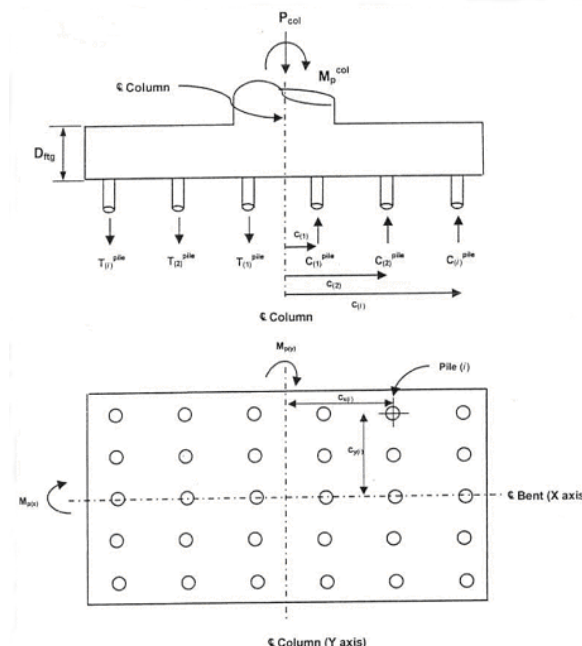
Simplified Pile Model for Foundations in Competent Soil
